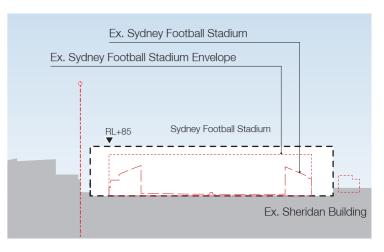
Section North South Looking West Stage 1 DA (Source: SJB)
